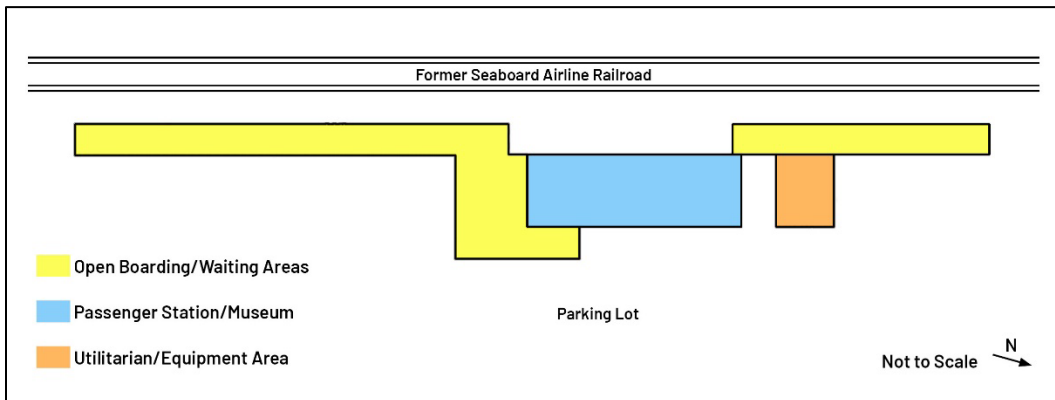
Venice Depot, 303 East Venice Avenue (S000585), site plan.
